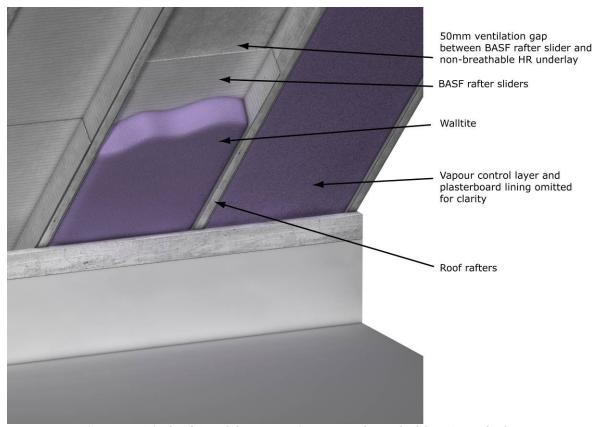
Pitched Roof Construction: non-breathable HR underlay
